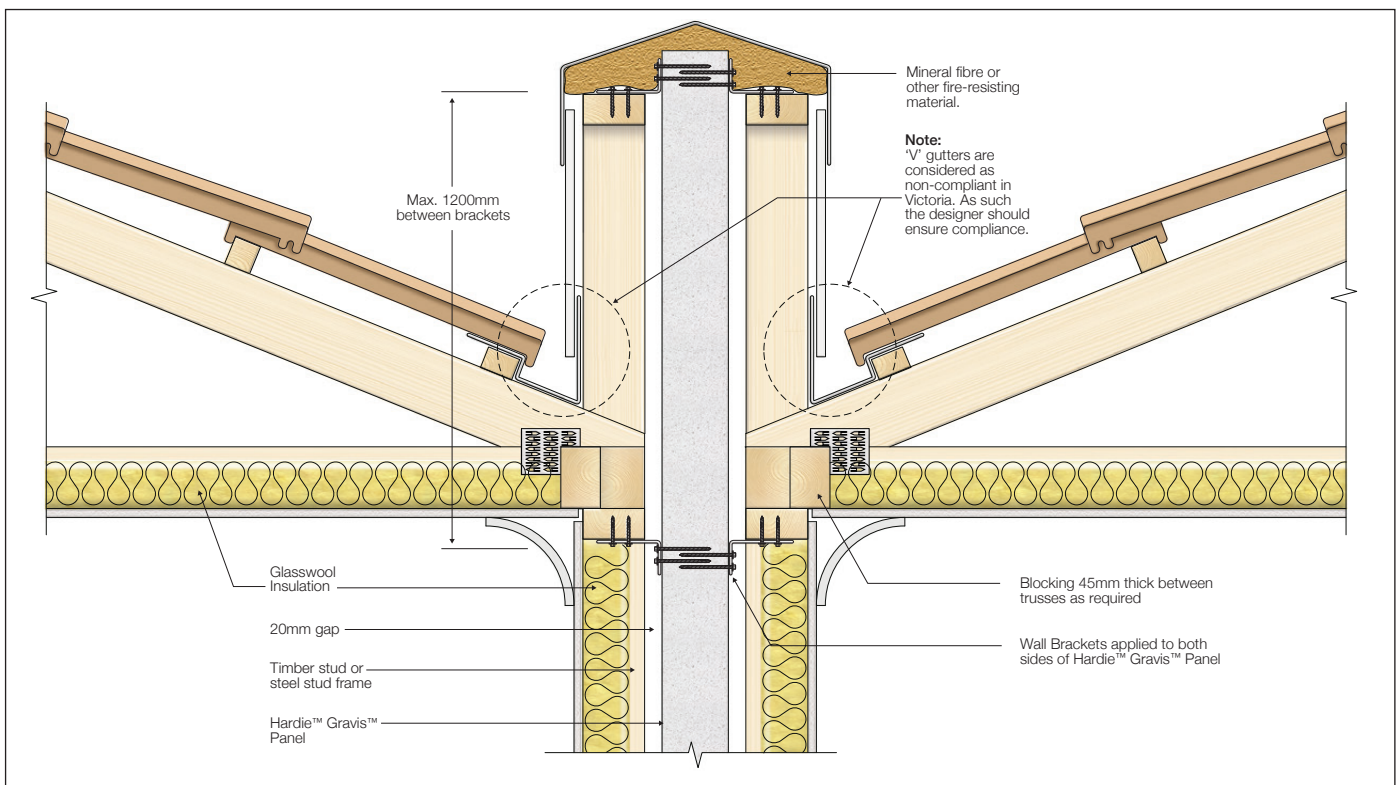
ROOF PARAPET FOR VERTICALLY ALIGNED INTERTENANCY DISCONTINUOUS WALL SYSTEM
